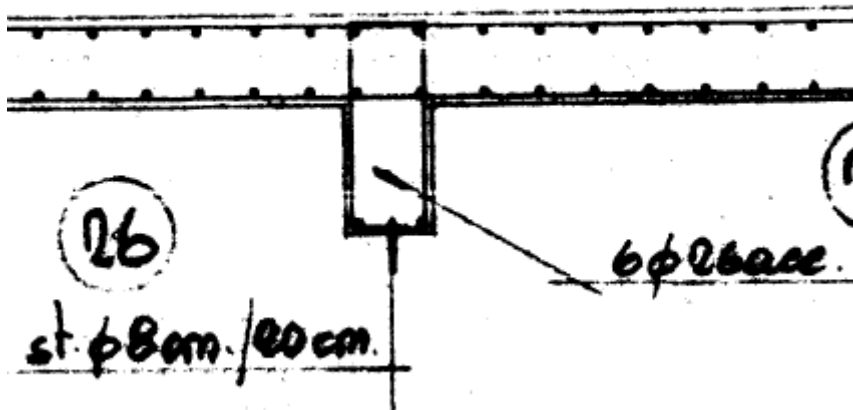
Steel reinforcement in  $40 \times 100$  columns.
